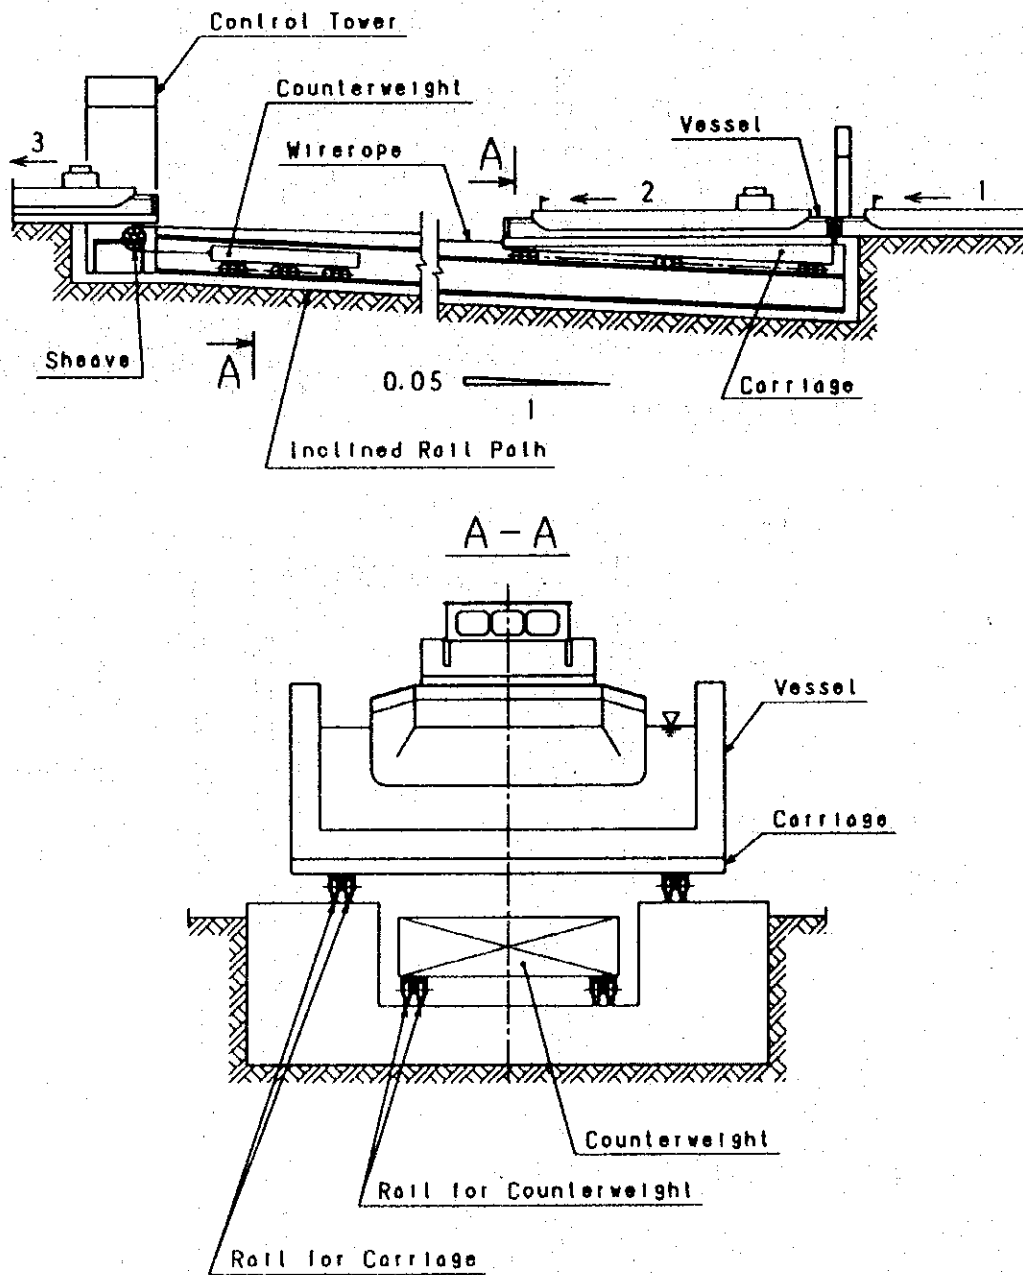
Schematic Arrangement of the Inclined Lift System
